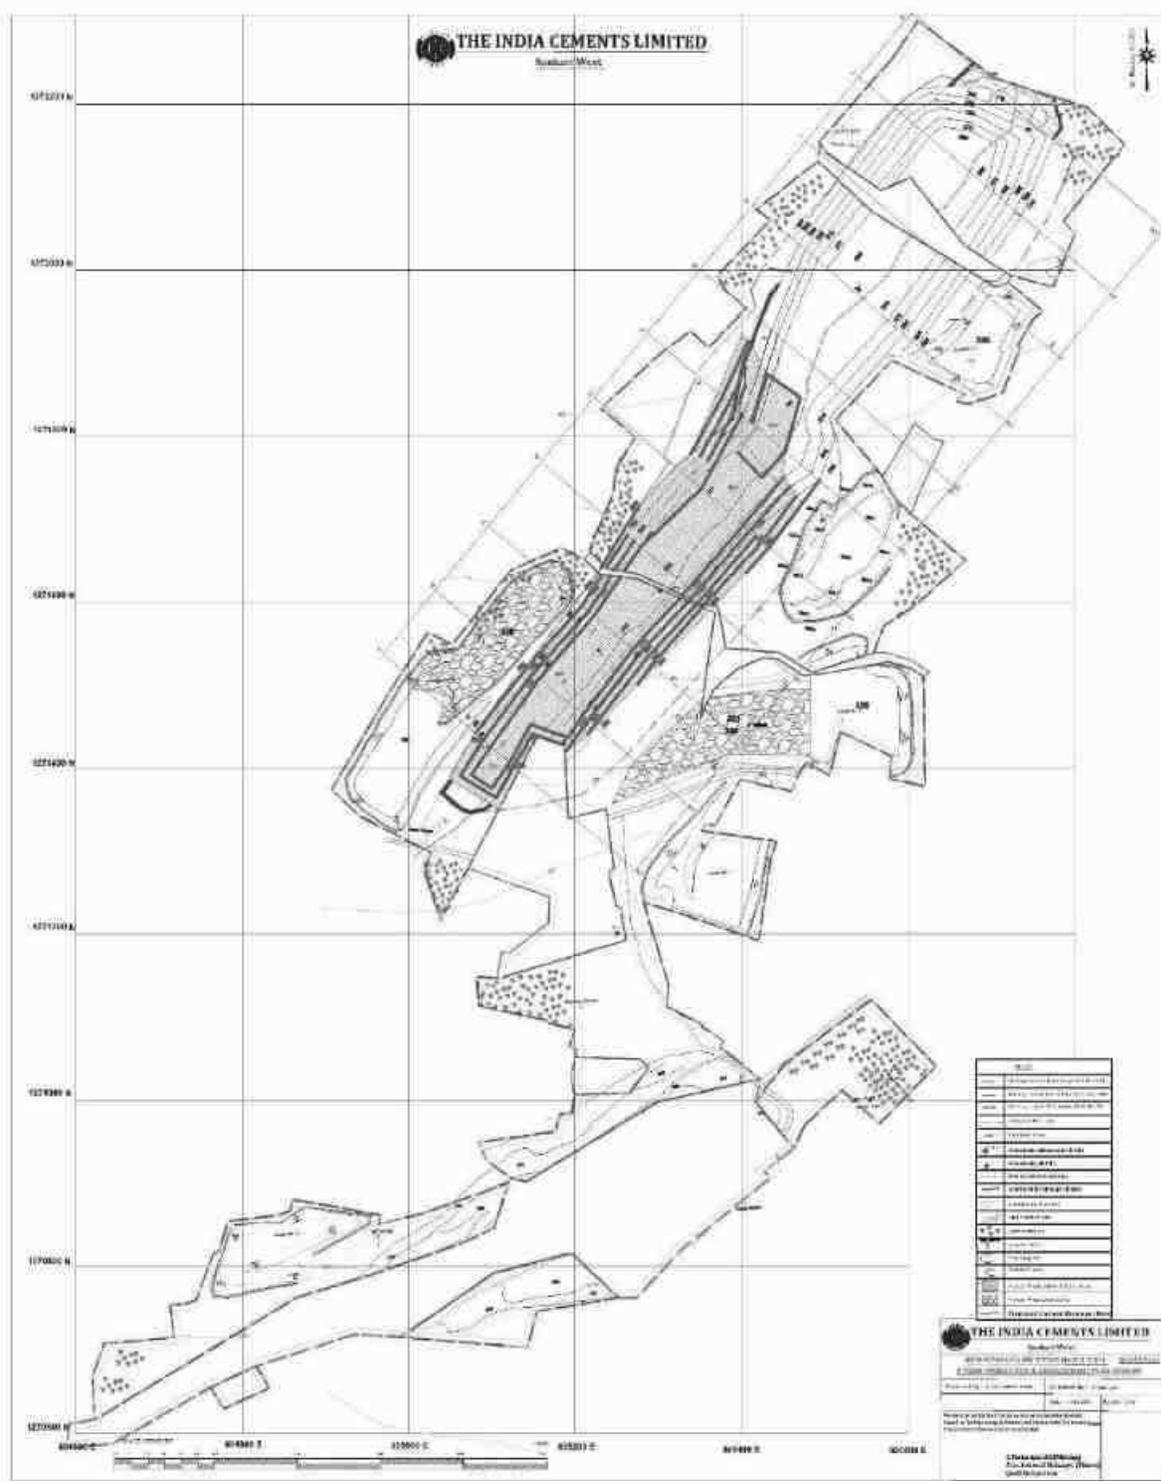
Mine Position at the end of Plan Period - G.O.76
